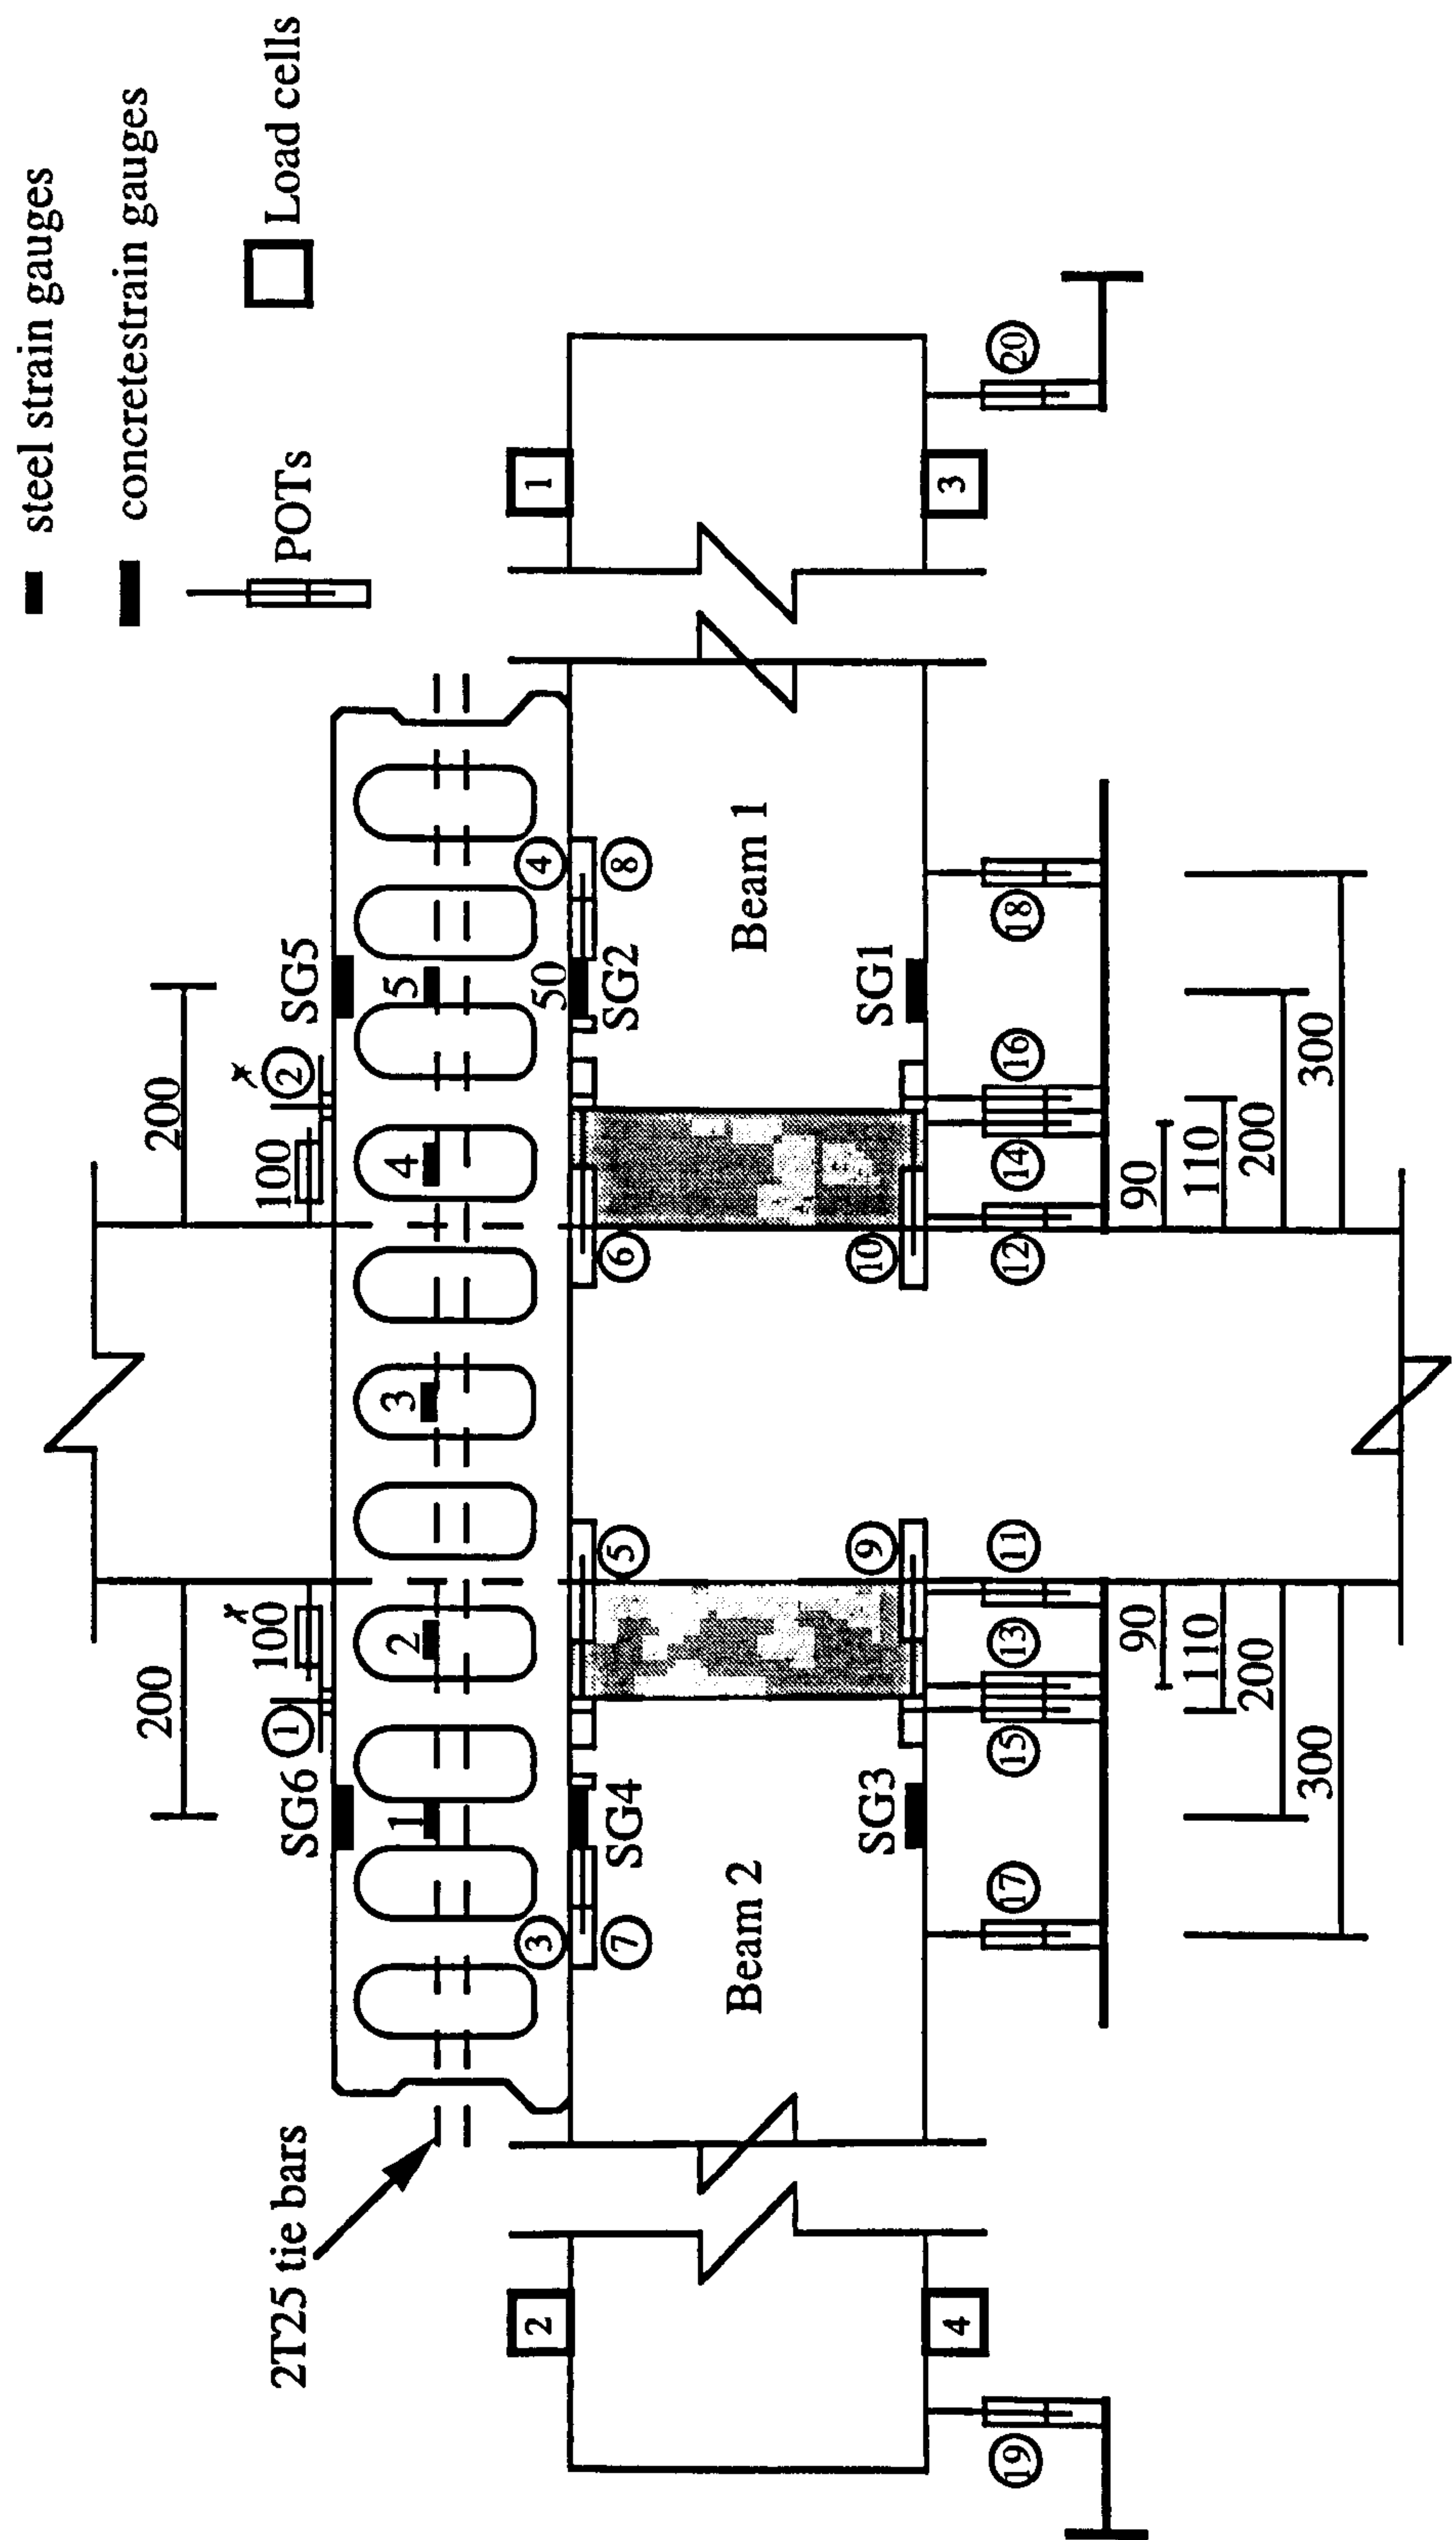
(a): Instrumentation (see (b) and (c) for detail)
